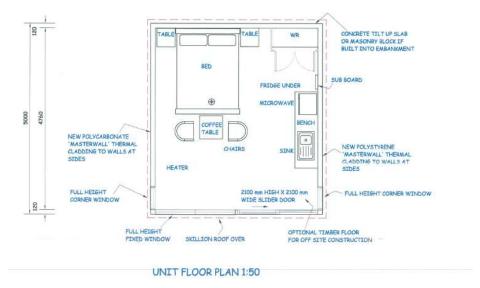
Unit floor plan, Drawing source. Weeda consultants Project 16618, 21/12/18
